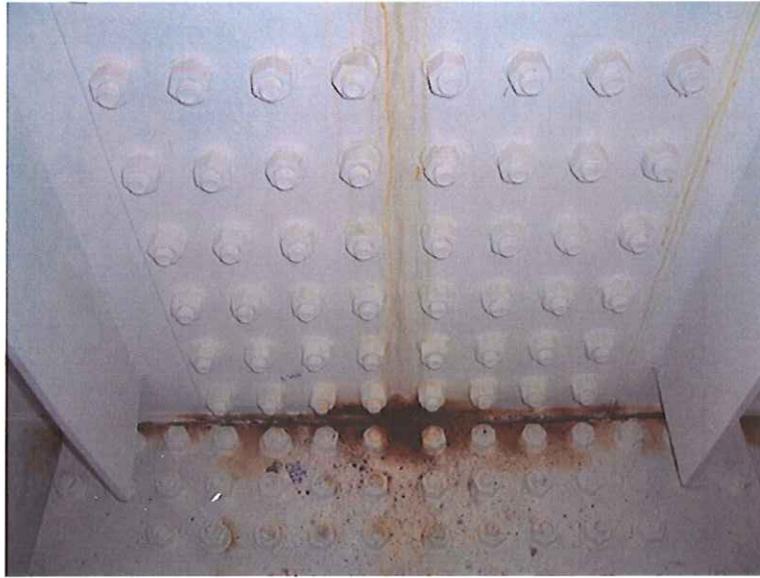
Tie girder splice - heavy corrosion at bottom flange corner
